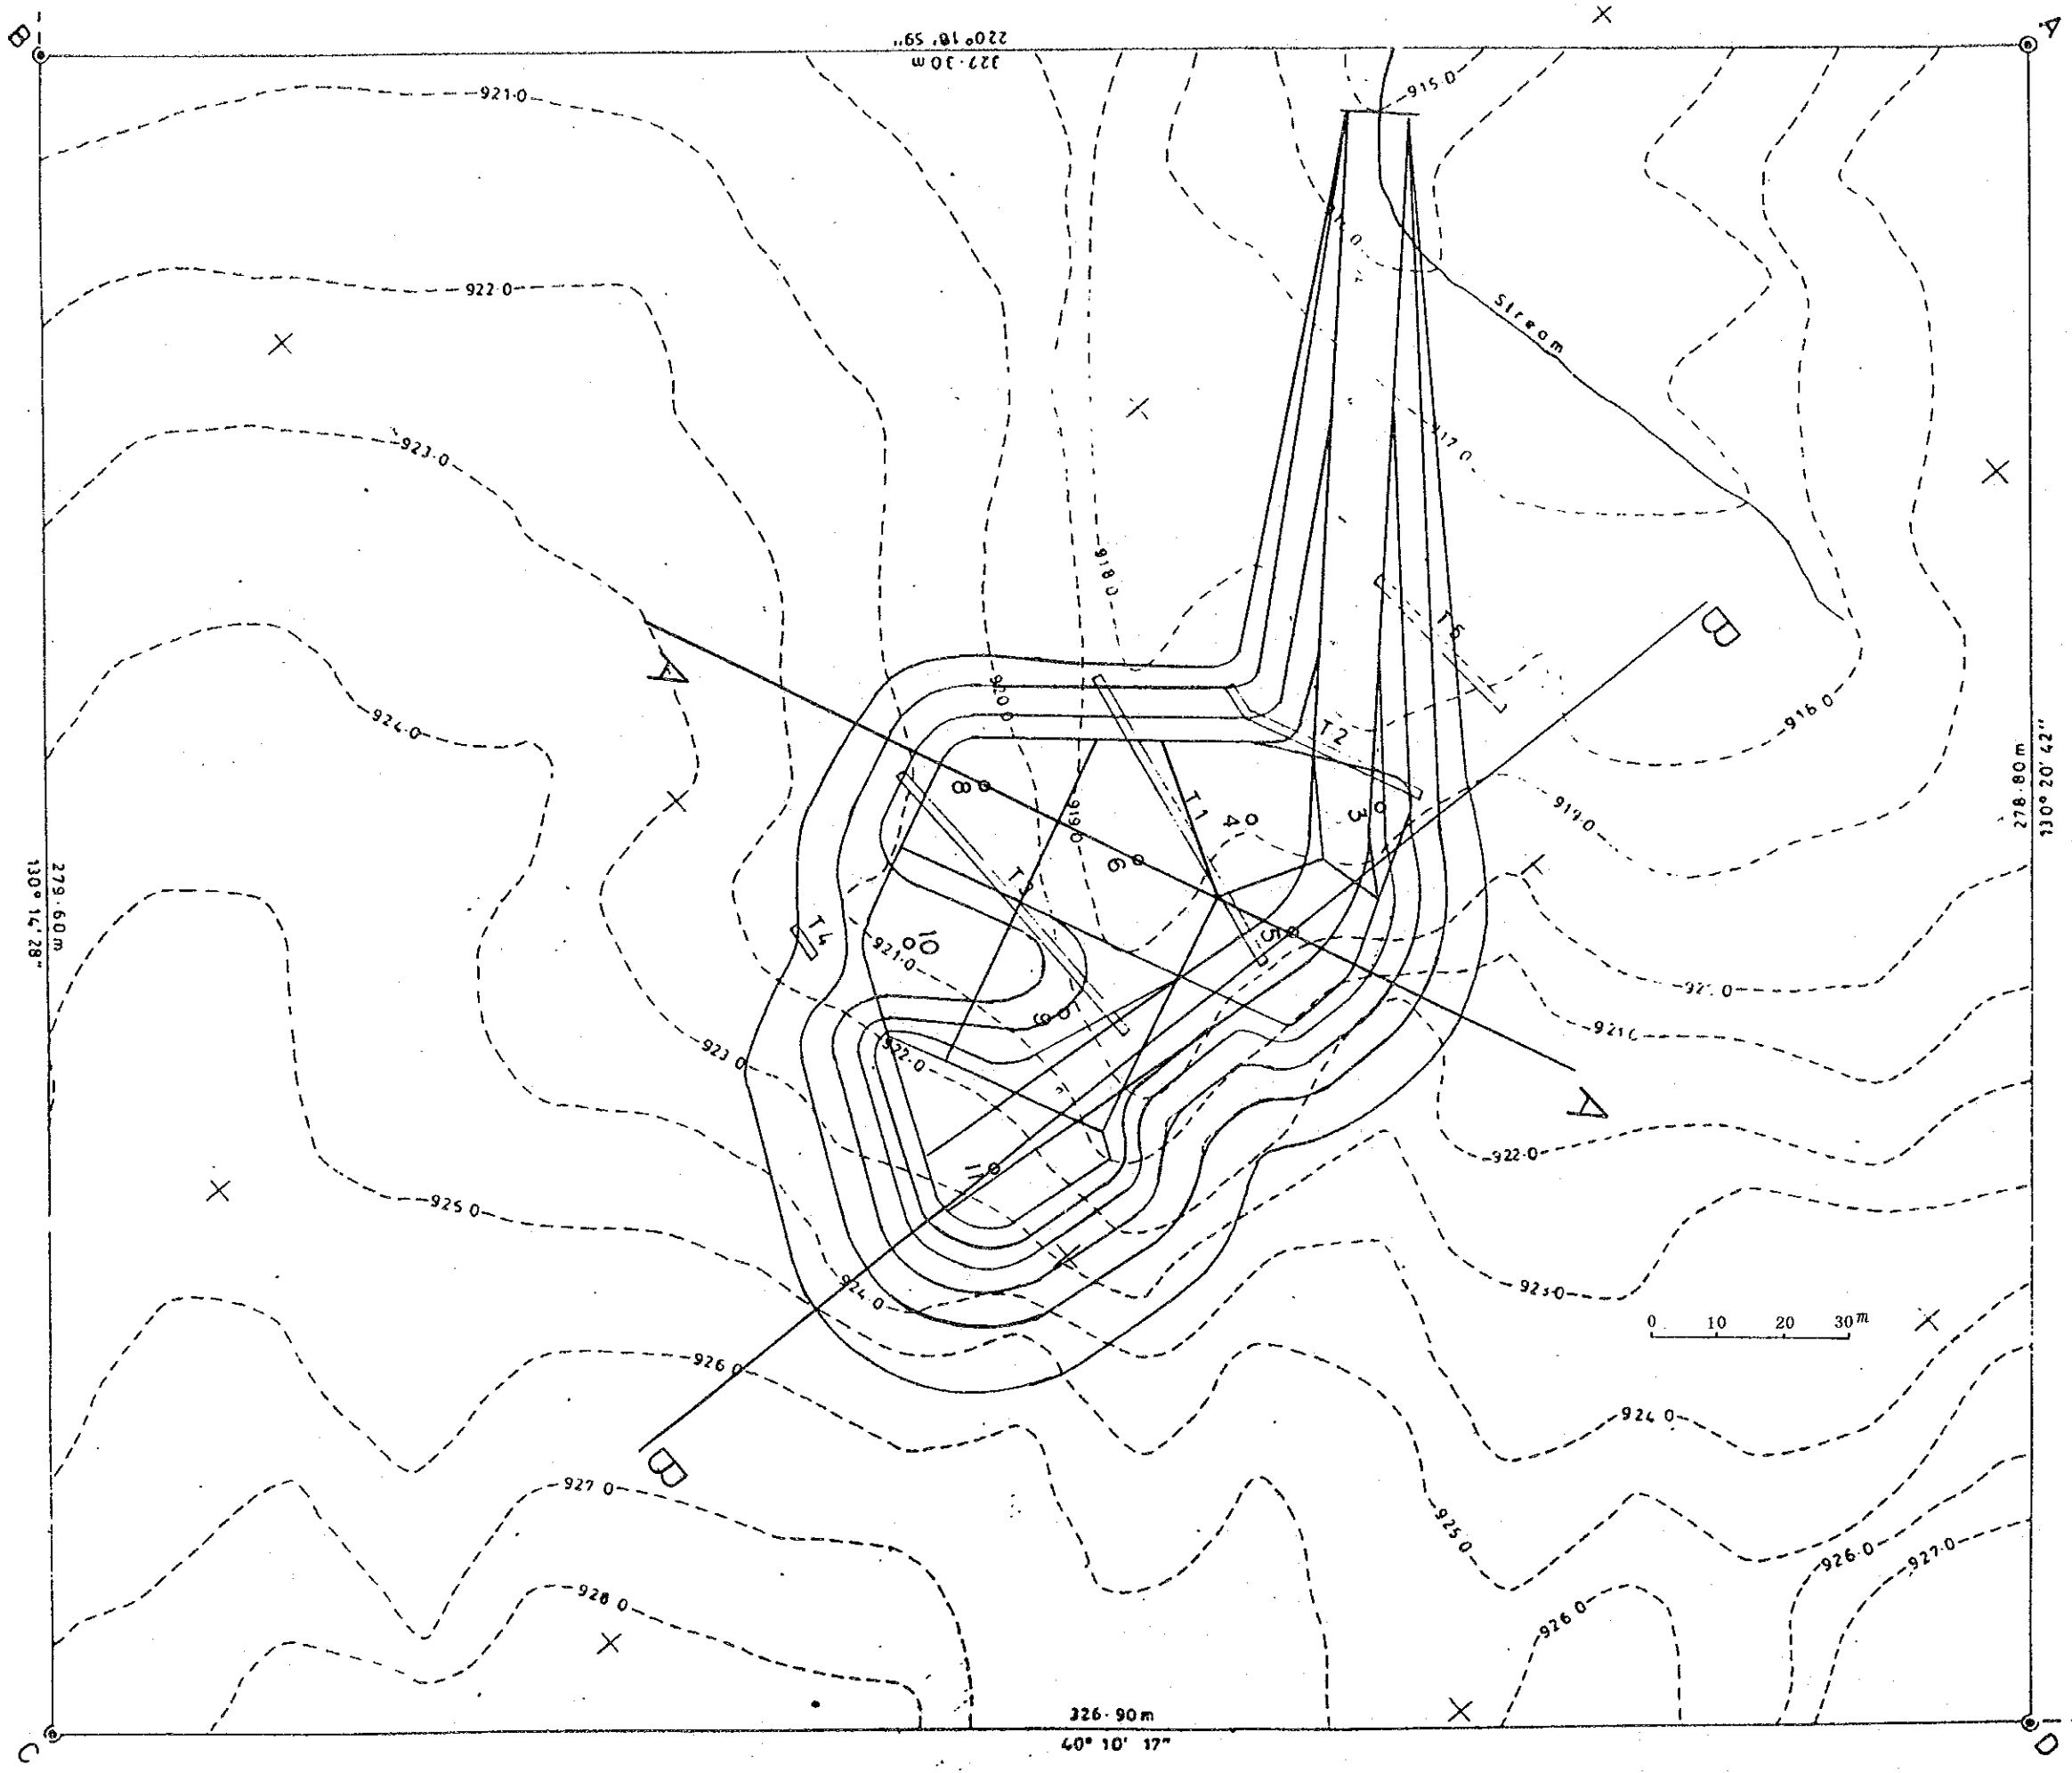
Final Pit Design for No. 4 Shallow Orebody. (1)
